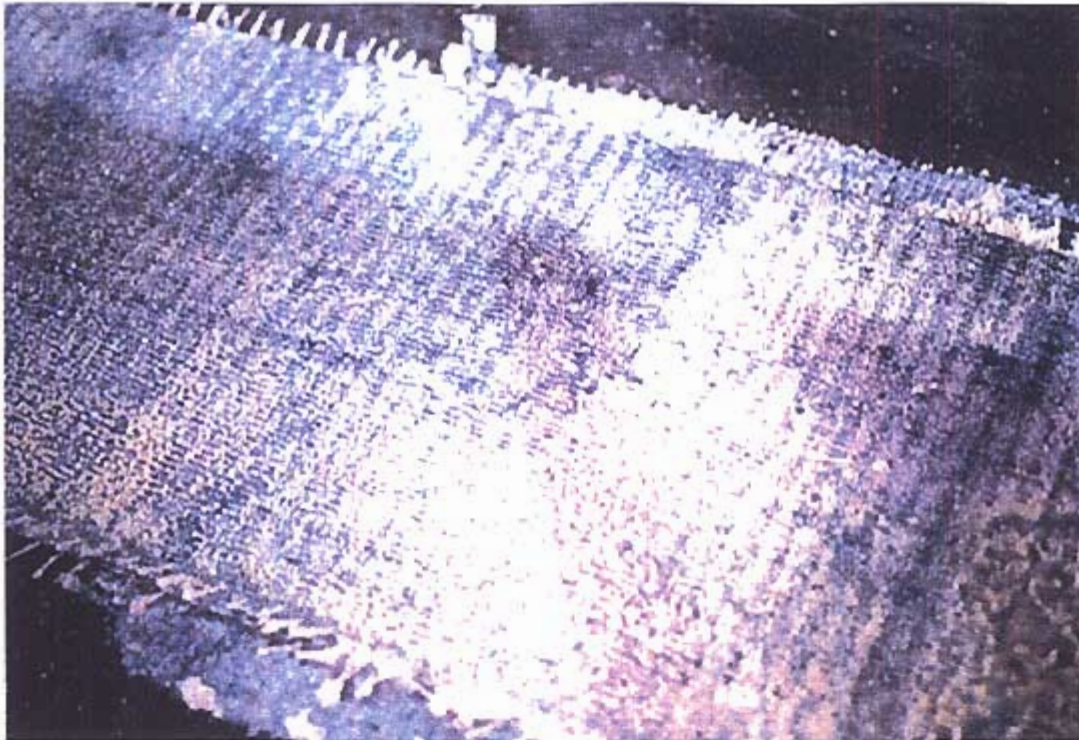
Test Specimen 4 at Failure Showing Shearing of FRP Stirrup
